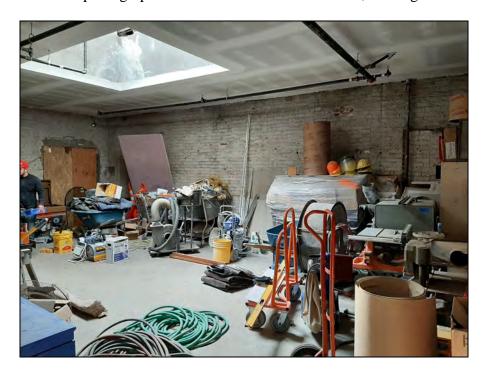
A 2021 photograph of the interior of the warehouse, looking west
